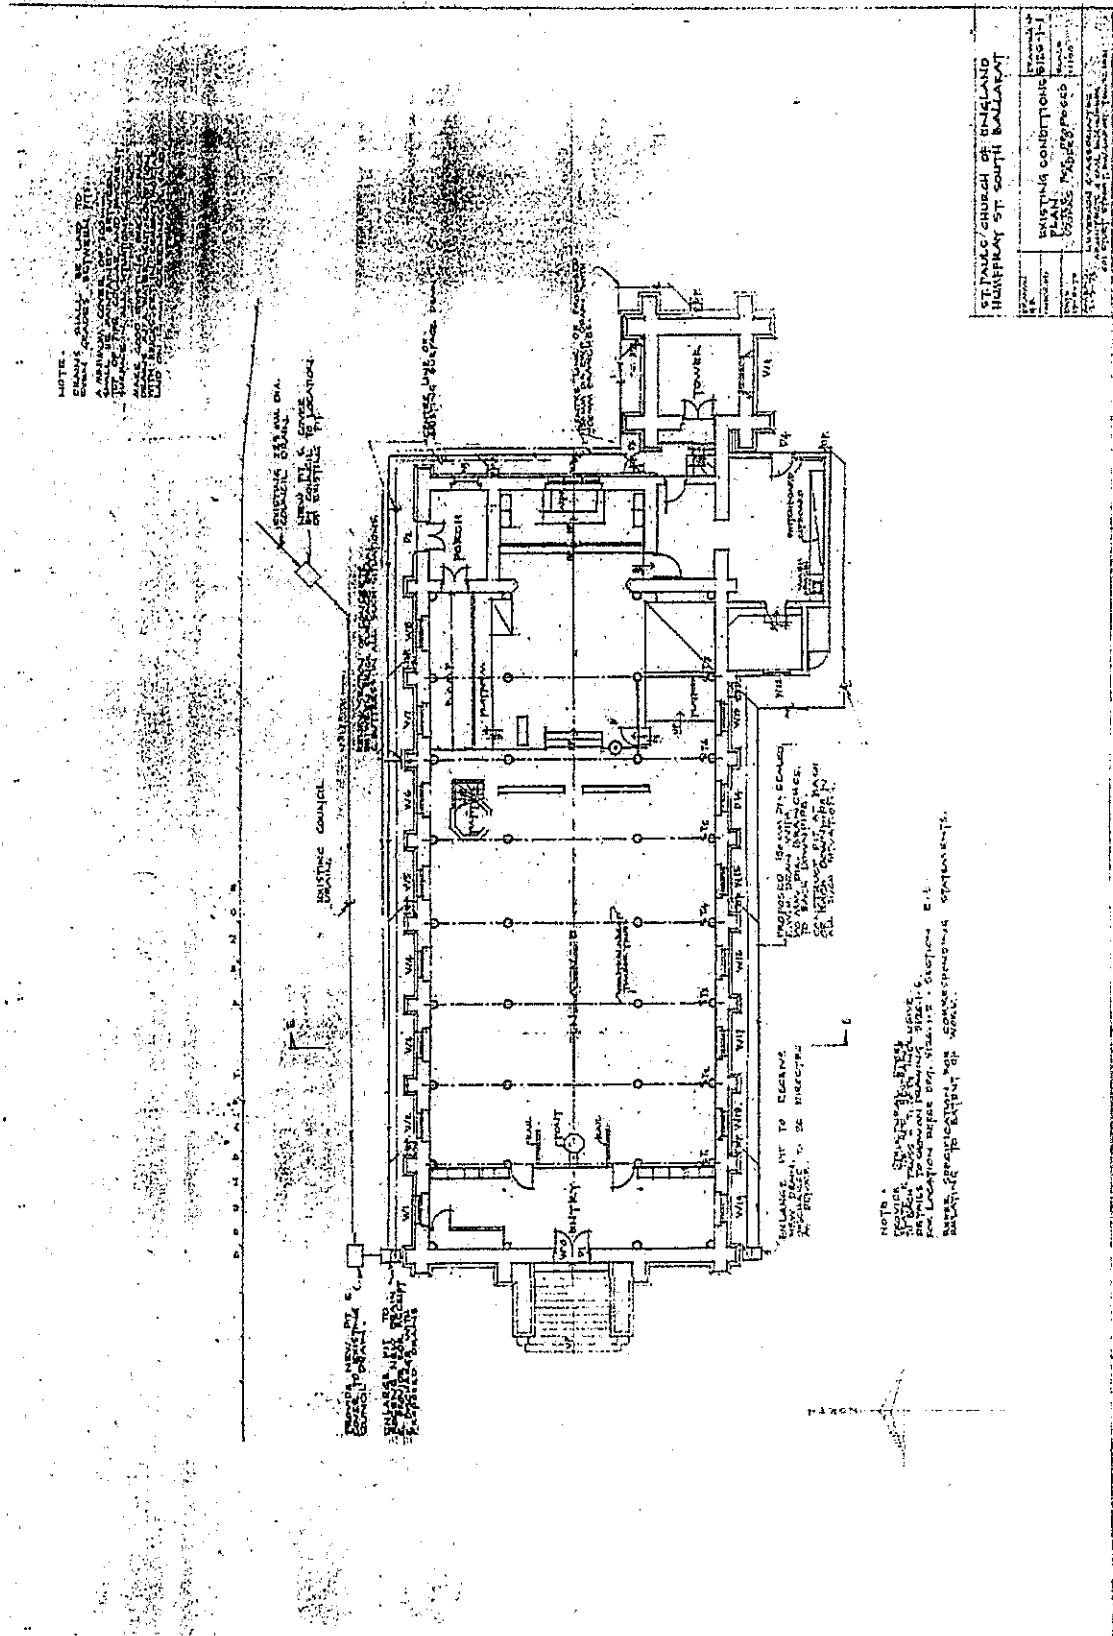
St. Paul's Church Existing Conditions Floor Plan by L.H. Vernon & Associates, 15 August 1978. Source: St. Paul's Anglican Church.
